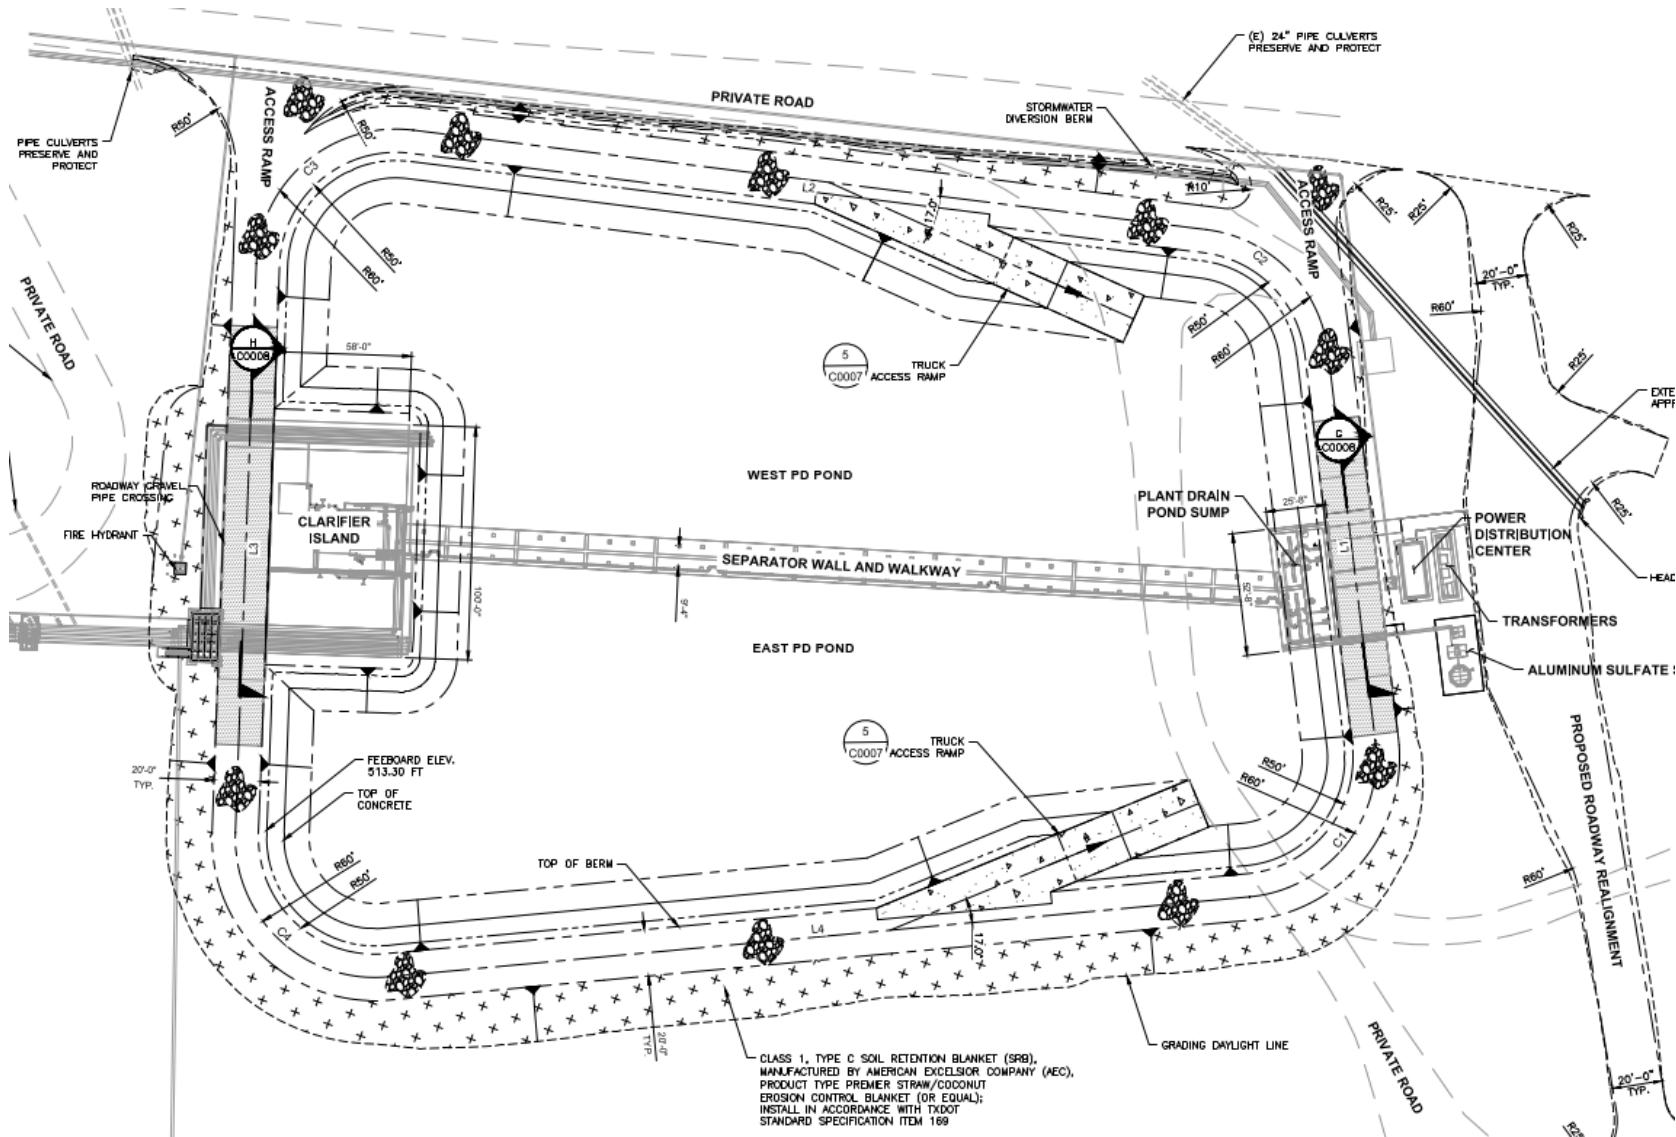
(continued) – Plant Drains Pond Transfer Area Arrangement
